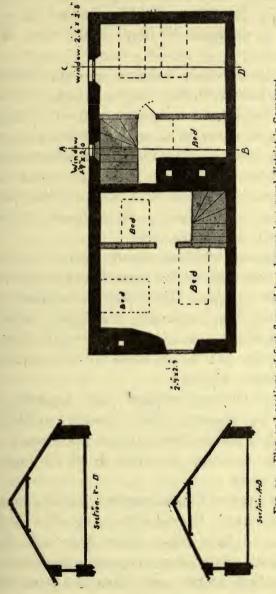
Plan and sections of first floor of two houses in a rural district in Somerset. Scale 12 feet to an inch.
